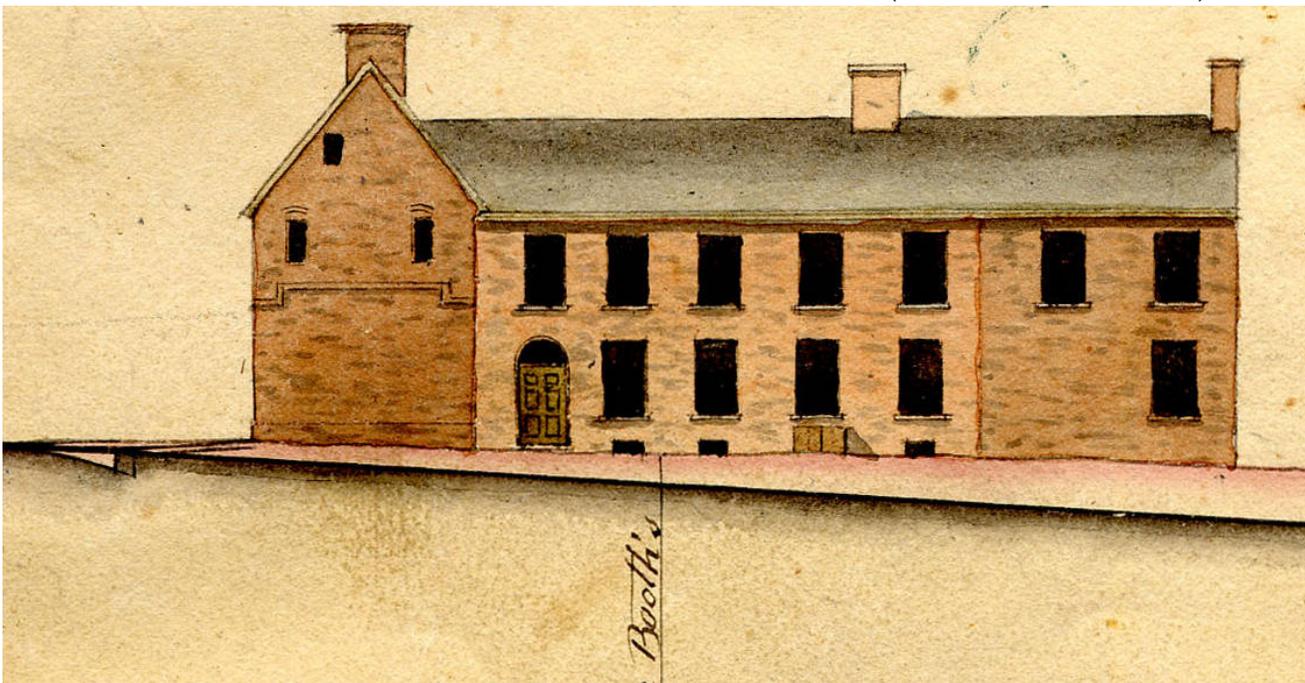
South elevation of the Sheriff's House and Jail building. From Latrobe's 1805 "Plan of the Town of New Castle." (Delaware Public Archives)
